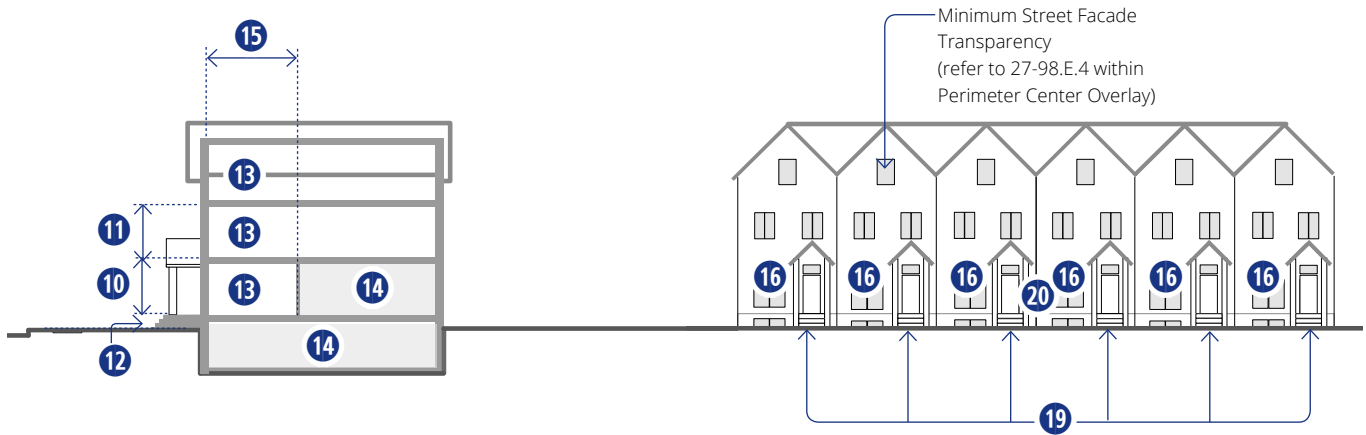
Townhouse Building: Floor-to-Floor Height & Use Requirements
